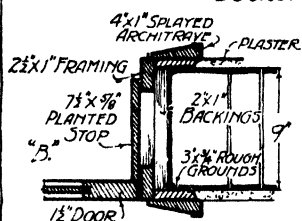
shows that rough grounds are also provided for the skirting along the floor level. These are dovetailed to the stile of the face grounds to the doorway.
